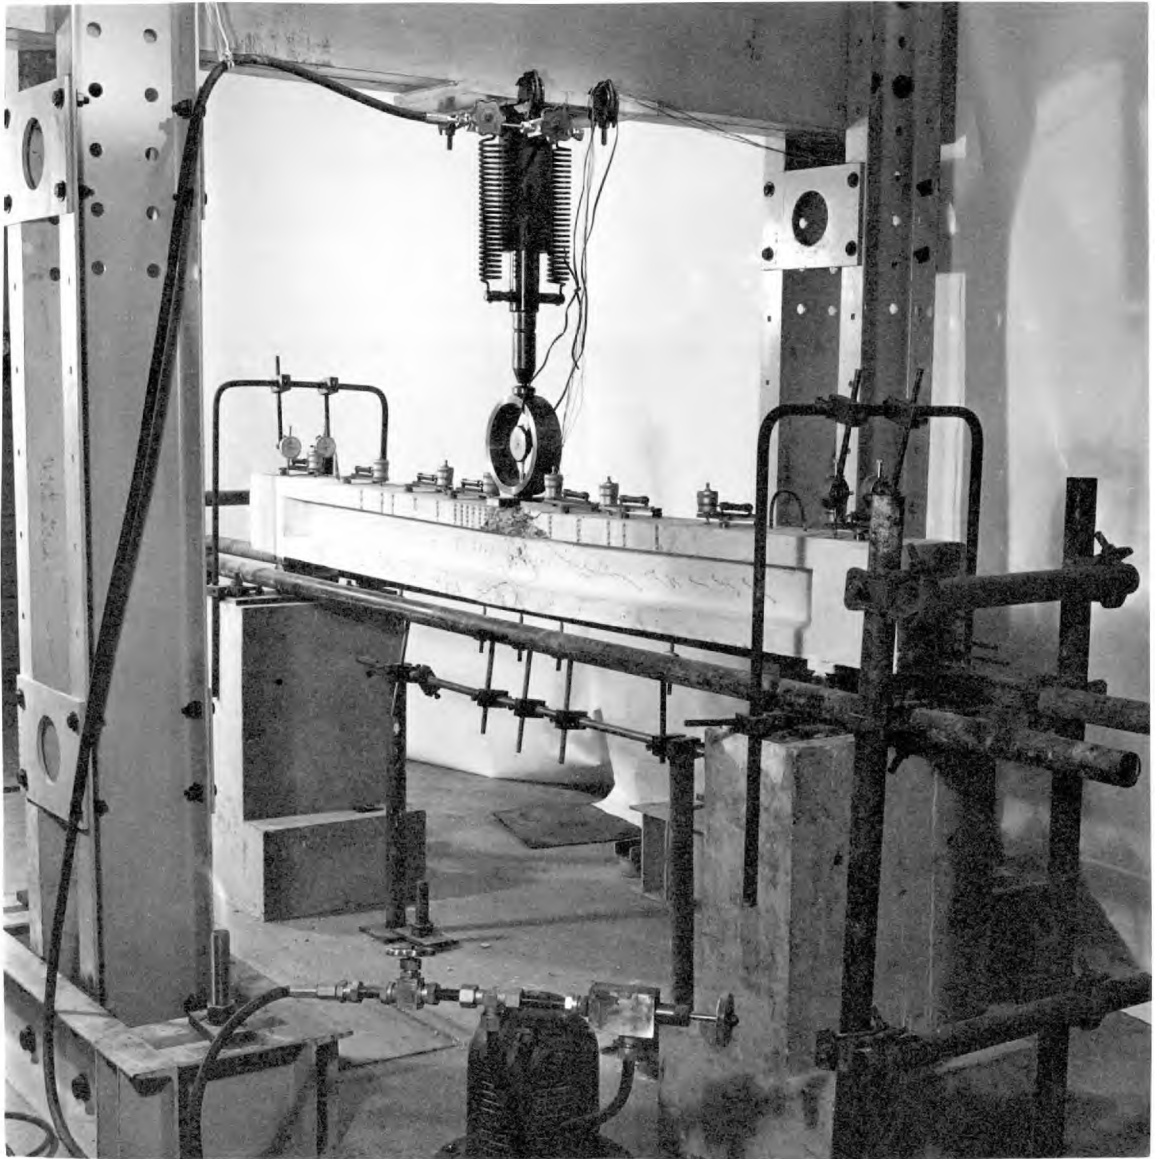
Test arrangement for beams 1 to 5 with Proving ring
